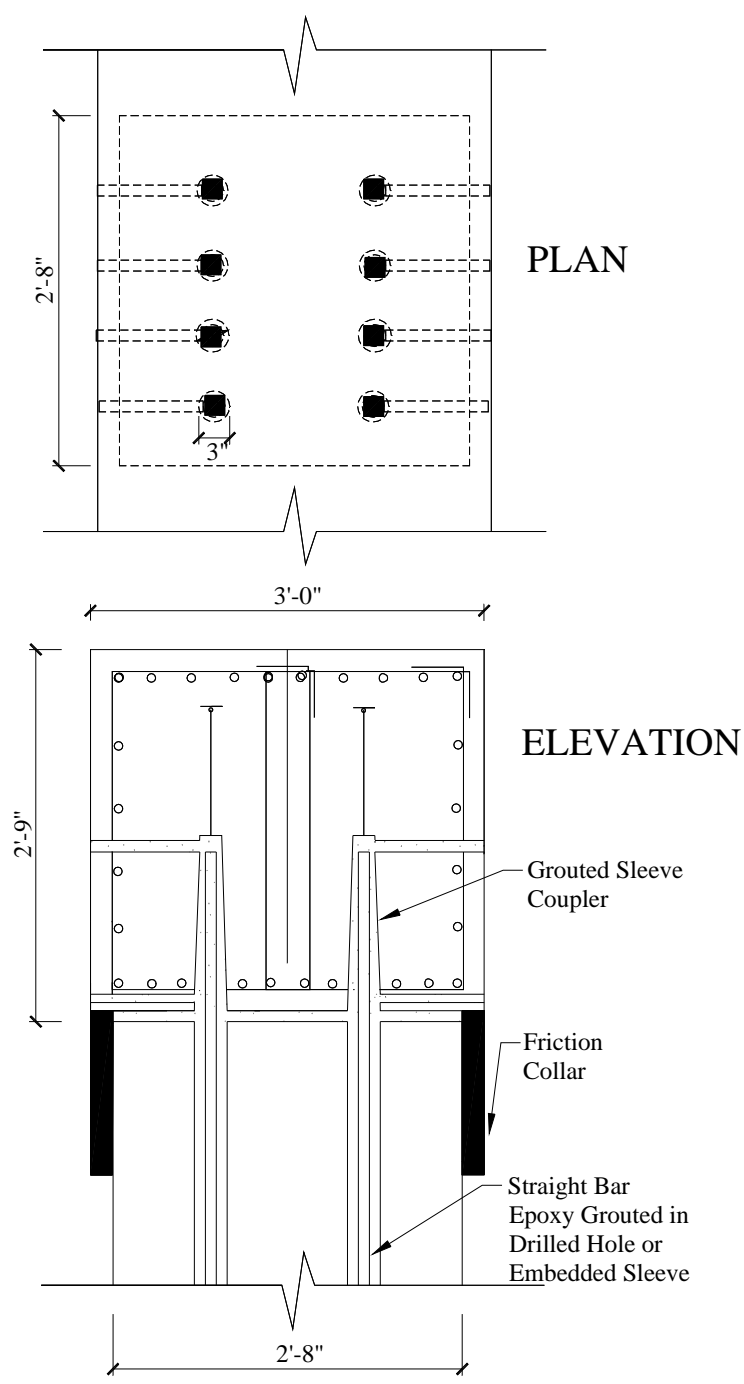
Grouted Sleeve Coupler Connection (GSC)
